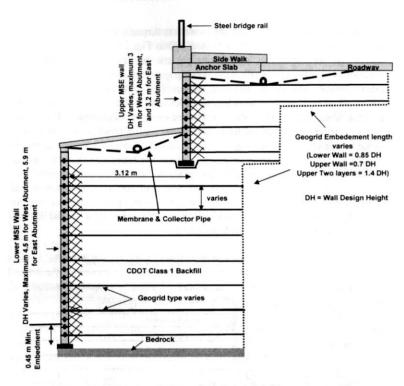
Typical Monitored Cross-Section (Sections 200, 400, and 800 in Fig. 2) through the Front and Abutment MSE walls
